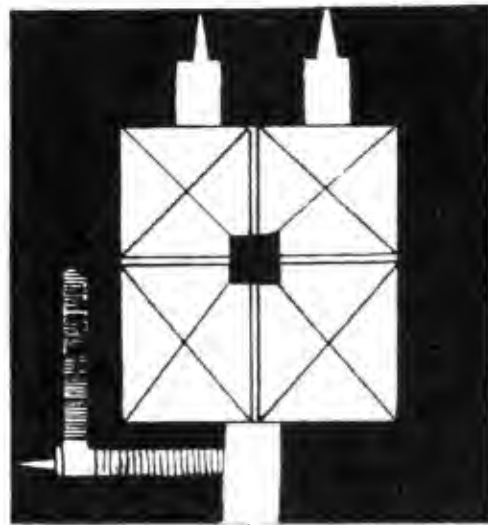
Drawing by T.E Lawrence of Soane castle with footprint showing vault construction and wall thickness.
